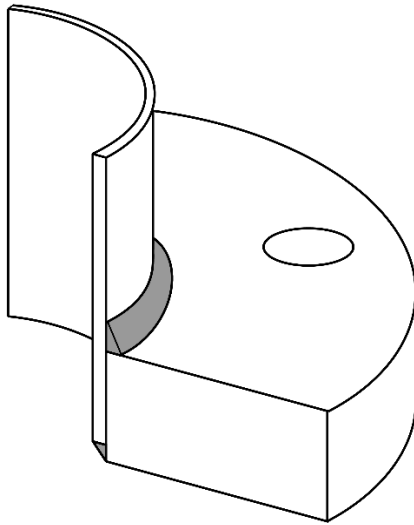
Illustration. Socketed post to base plate connection with fillet welds.
